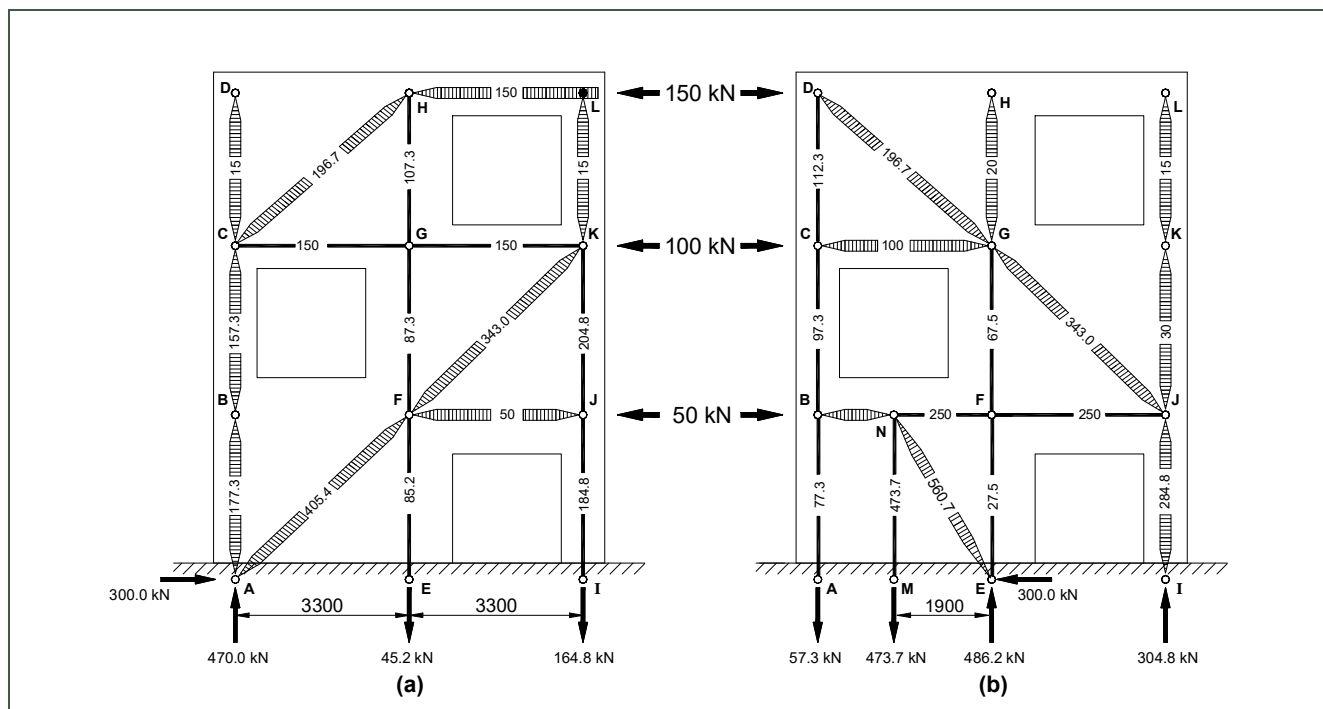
Strut-and-Tie Models for Masonry Wall (Seismic and Gravity Loads)
